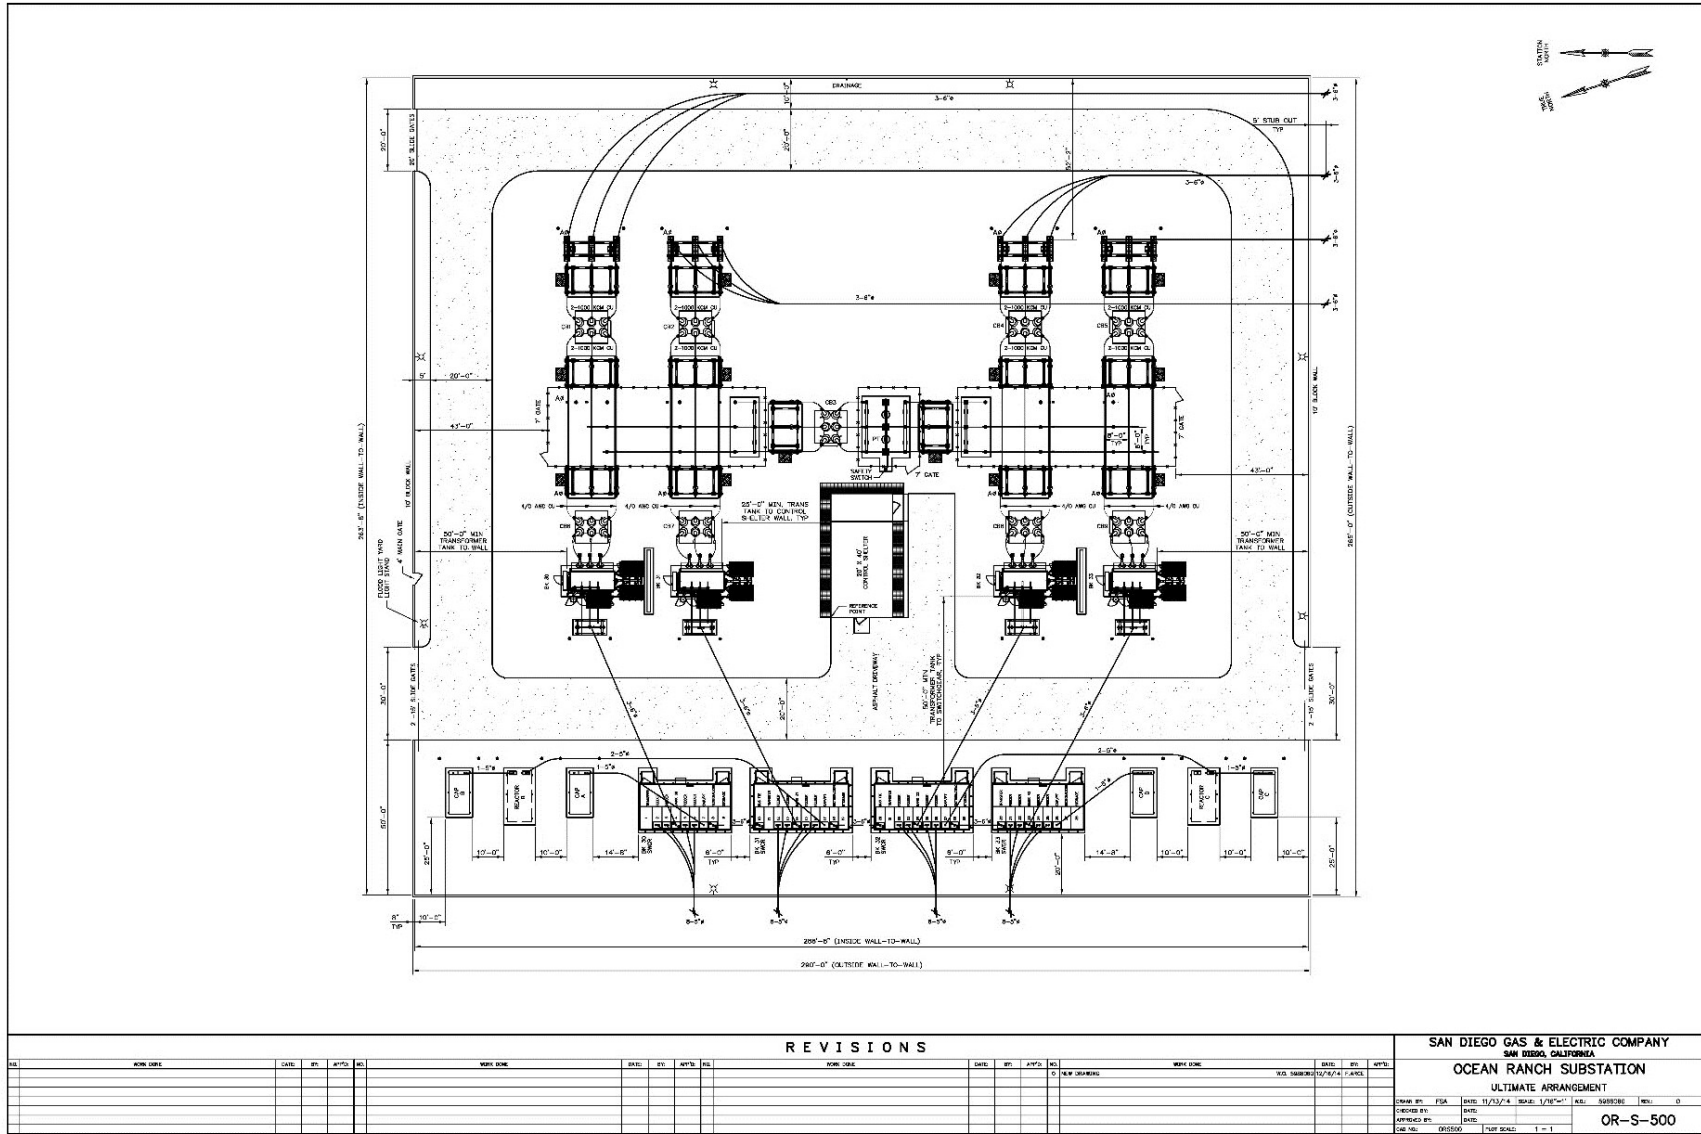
Proposed Ocean Ranch Substation Ultimate Arrangement
